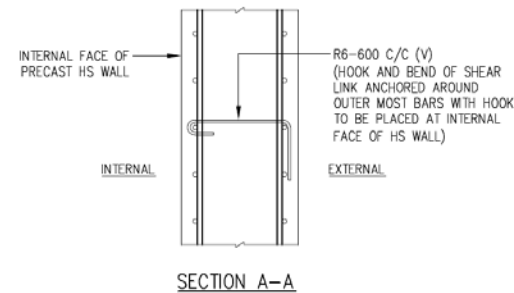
REINFORCEMENT BAR DETAILS OF WALL AND RIB FOR PRECAST HS (TYPE 2)
